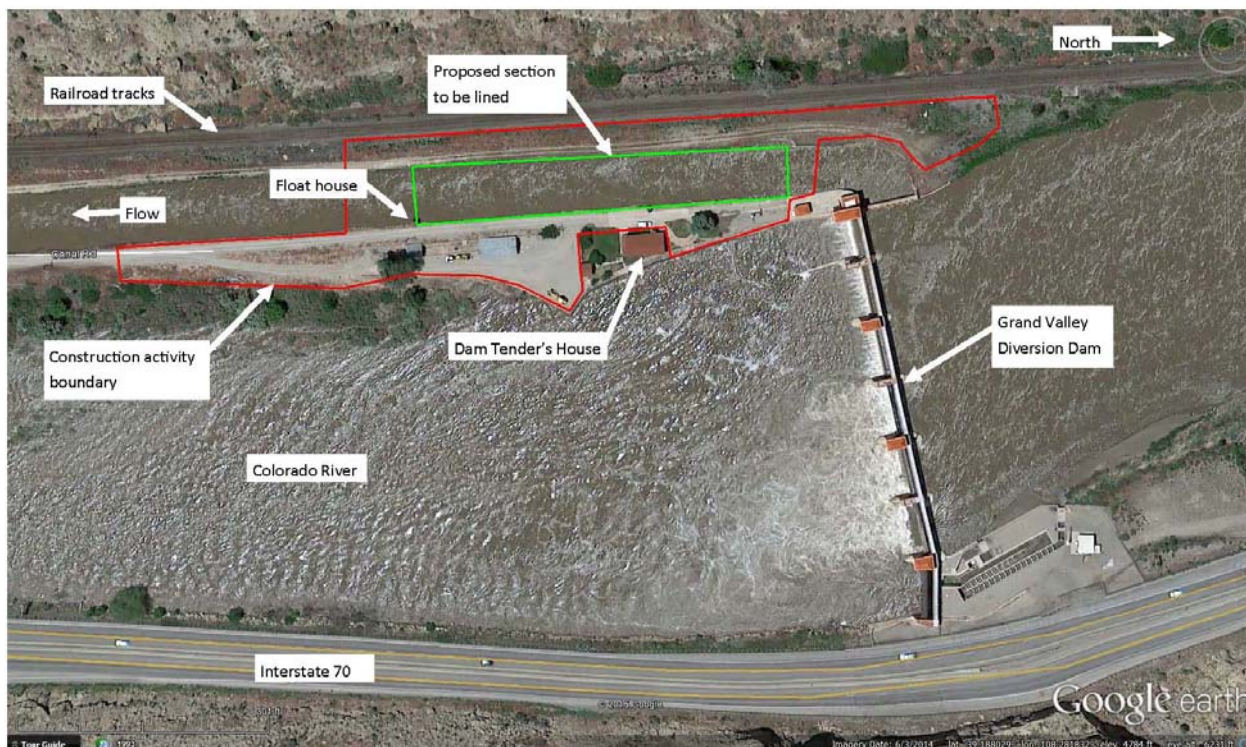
Aerial View of the Roller Dam (Grand Valley Diversion Dam) and Top 500 Feet of the Canyon Canal to be Lined.
